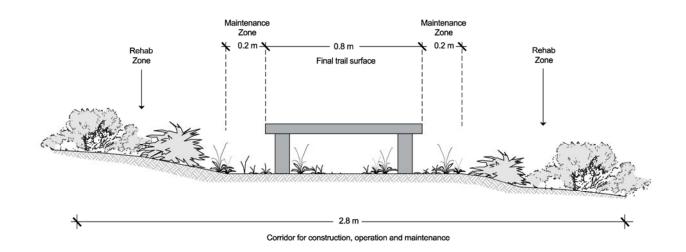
Typical cross section of the subject site for elevated structures trail surface
